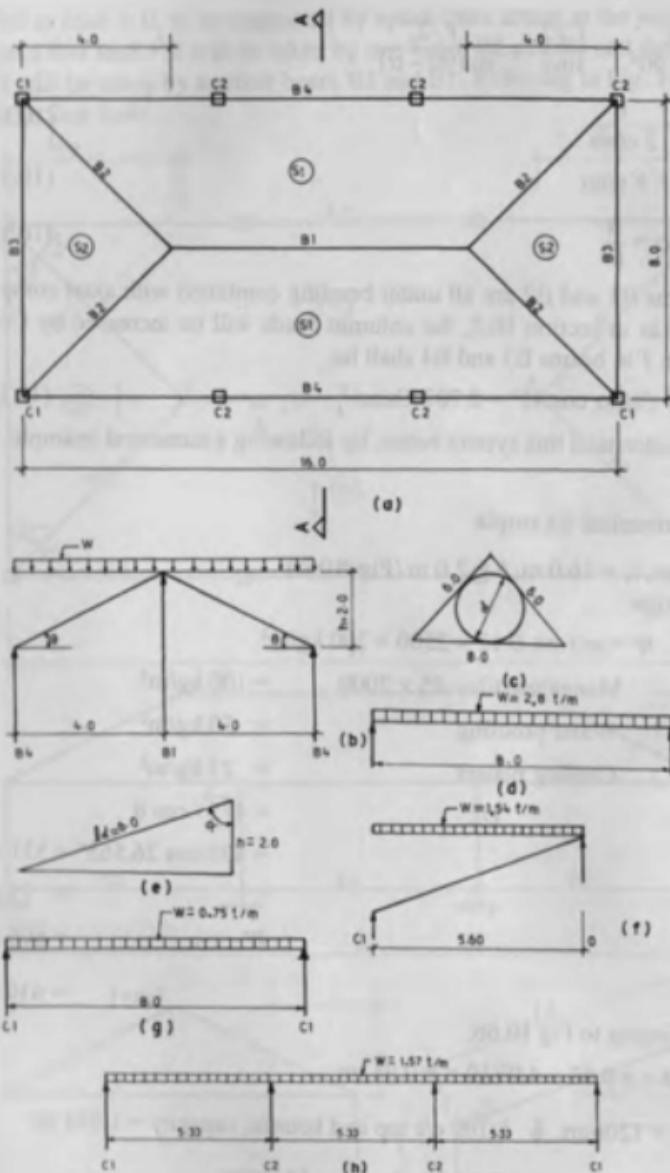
Details of numerical example of 10.3.1. (a) Plan of roof; (b) section A-A (design of slab S1); (c) Triangular slab S2 with dimensions of sides a , b , c in the inclined plane; (d) Design of beam B1; (e) Evaluation of angle α ; (f) Design of beam B2; (g) Design of beam B3; (h) design of beam B4.
